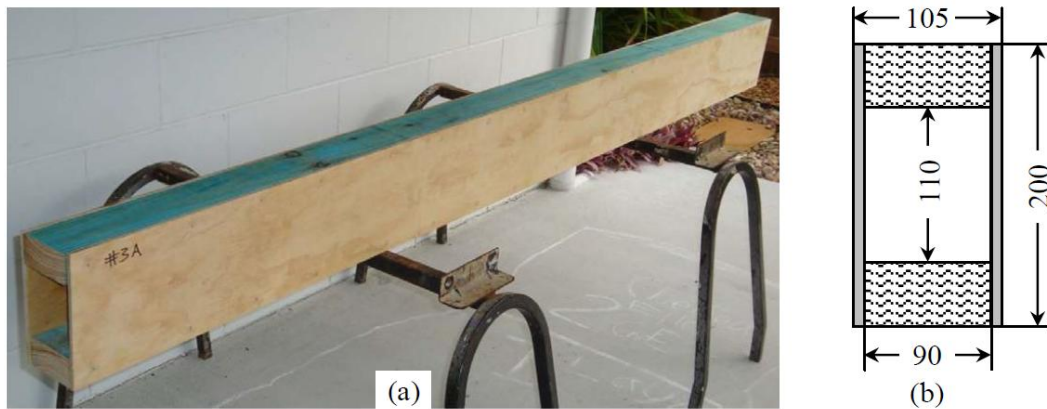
(a) Assembled timber composite beam and (b) its cross-section dimensions.
